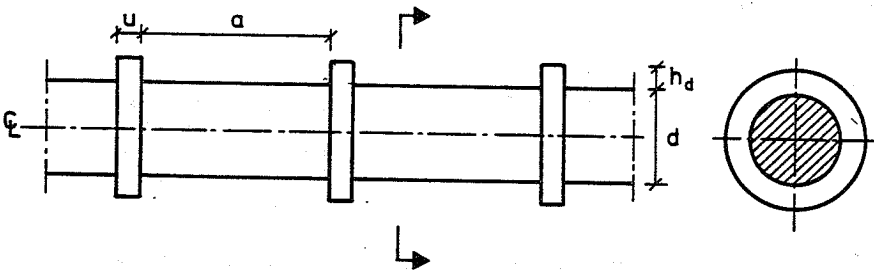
Rib geometry of a deformed reinforcing bar.
